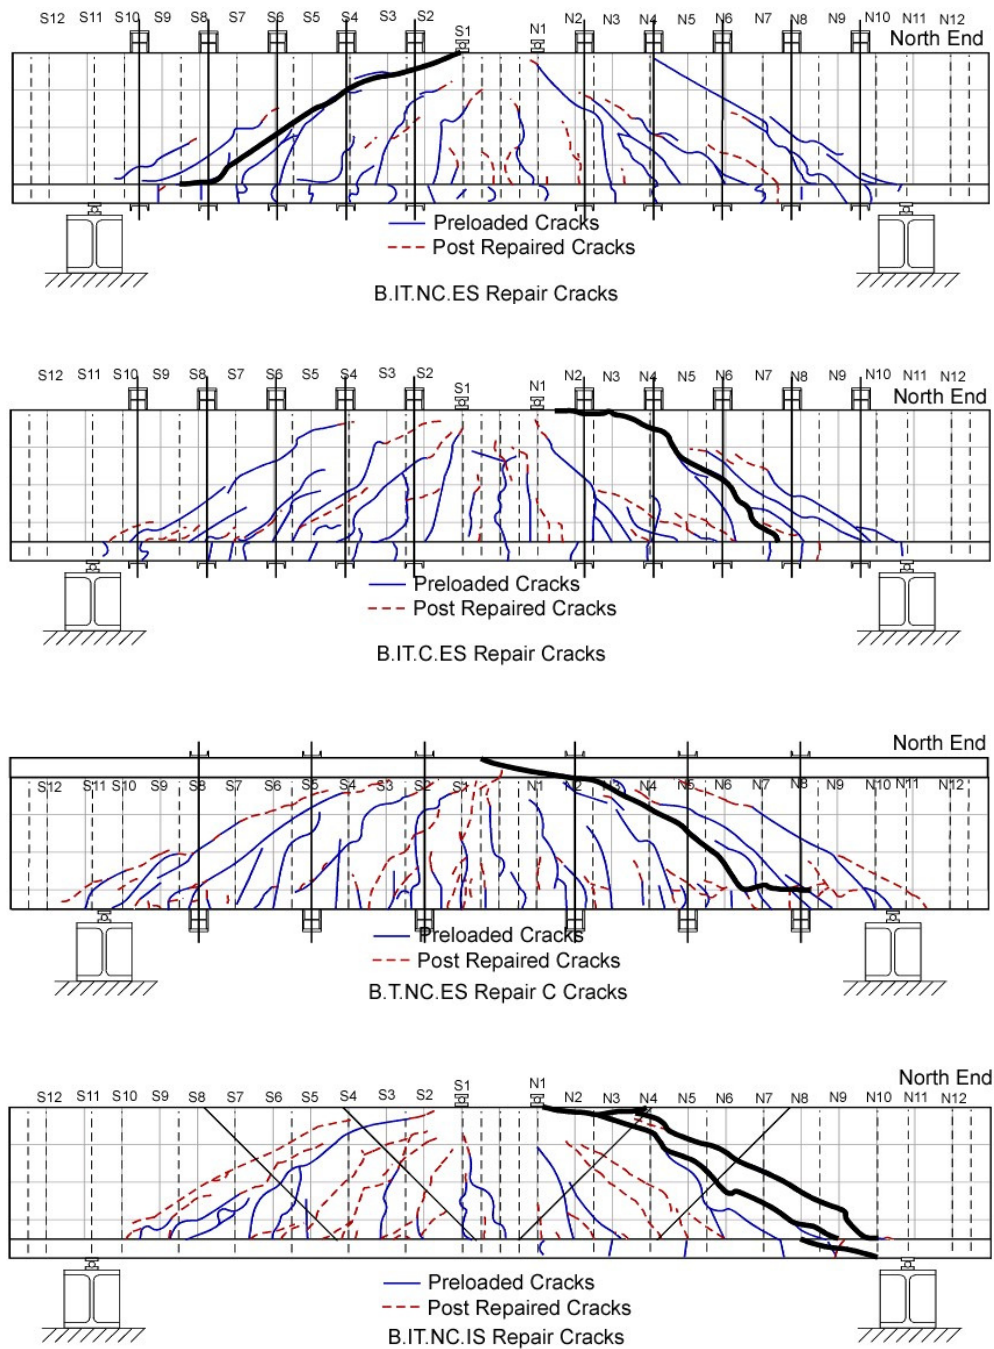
Beam specimen crack maps: precrack versus repair
